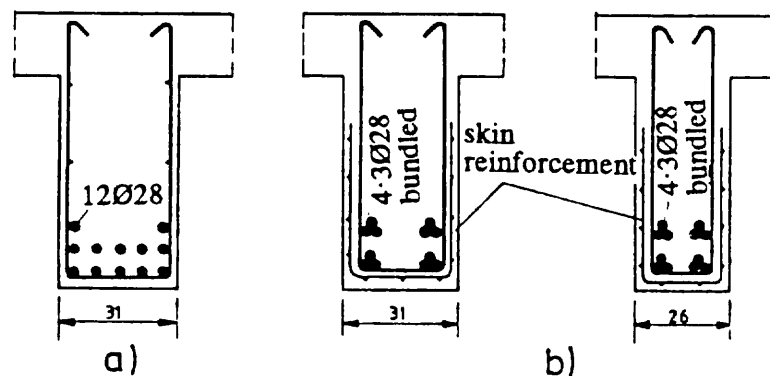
Arrangement of reinforcement in the section: a) single bars, b) bundled bars, after Rehm et al (1978)
